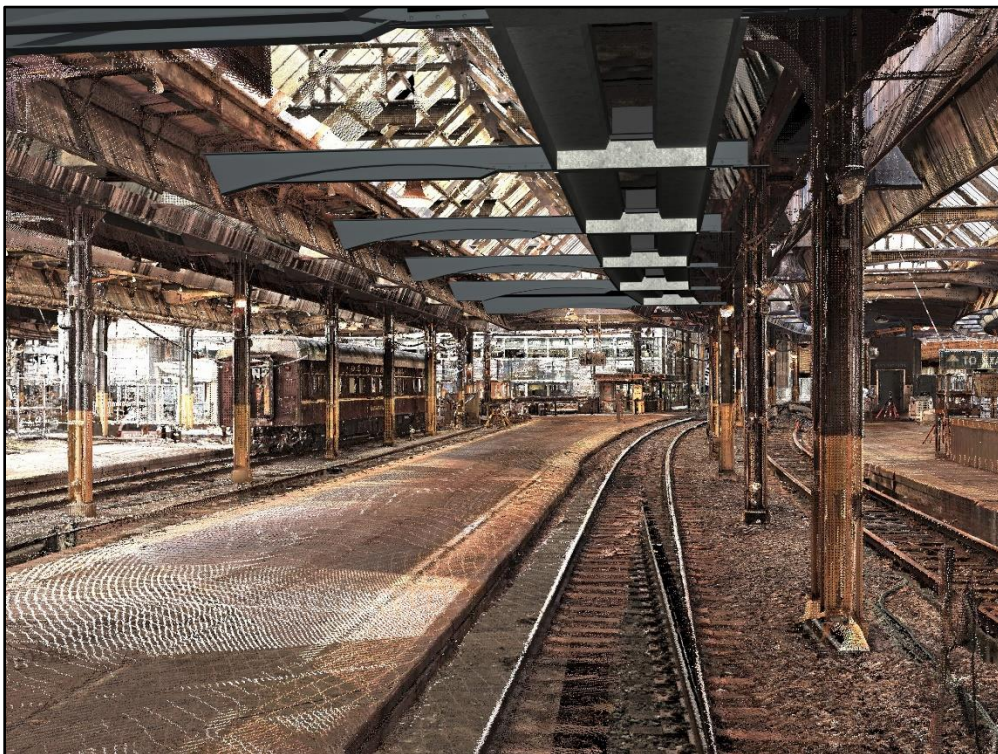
Rendering of retrofitted girders and exhaust chutes over Track 1 through trainshed, facing southwest.
